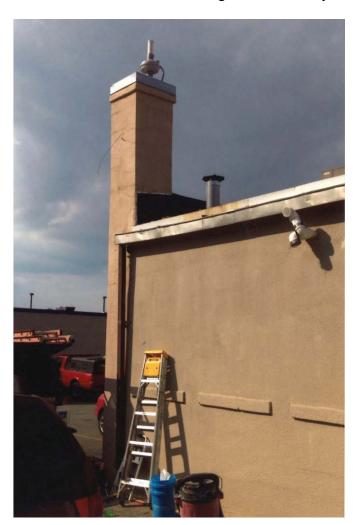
View looking northwest at southwest corner of 2803-2807 University Avenue building showing mitigation system fan and exhaust point.
